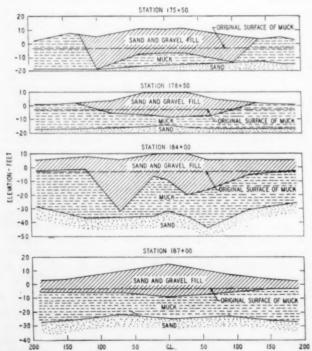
Cross Sections of FILL as Indicated by Borings.
